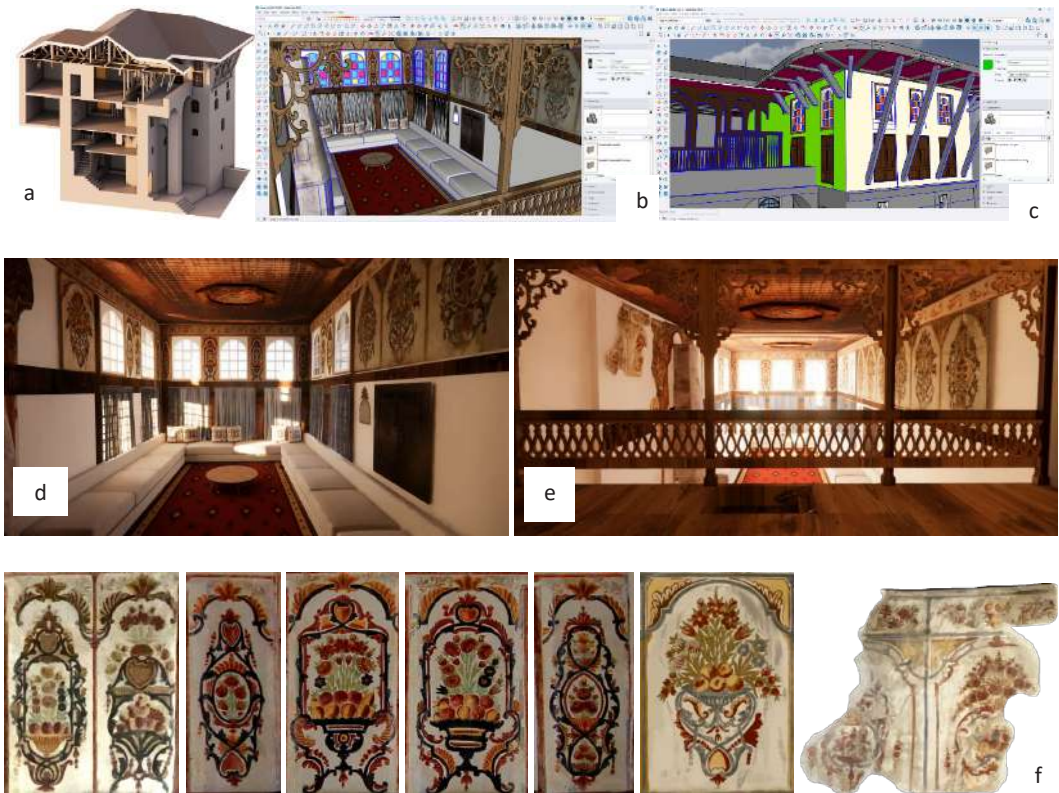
(a) Axonometric BIM model of Zekate House in Revit, sectioned to reveal structural and spatial composition. (b) Integrated SketchUp extracts detailing Oda e Burrave features. (c) Façade view highlighting çatma walls, testeke elements, and double windows. (d) Interactive 3D model of the men's room in TwinMotion. (e) Immersive VR perspective from the musandra level. (f) Digitized murals and artifacts integrated into the TwinMotion model for advanced heritage visualization.
